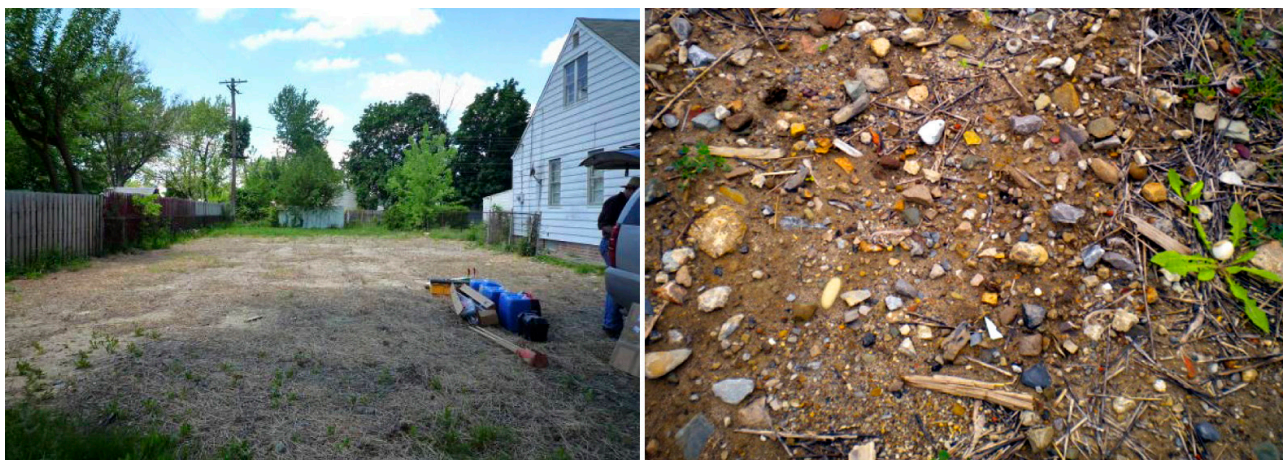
The case study location. Left photo shows the site post-demolition. Photo on the right shows an example of construction debris left after demolition.
